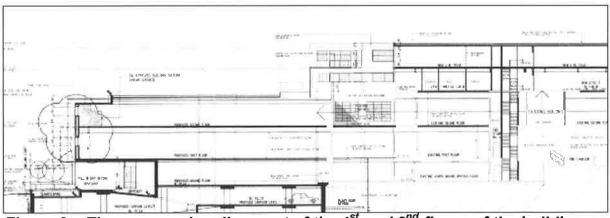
The proposed realignment of the 1st and 2nd floors of the building on the Sinclair Street site
